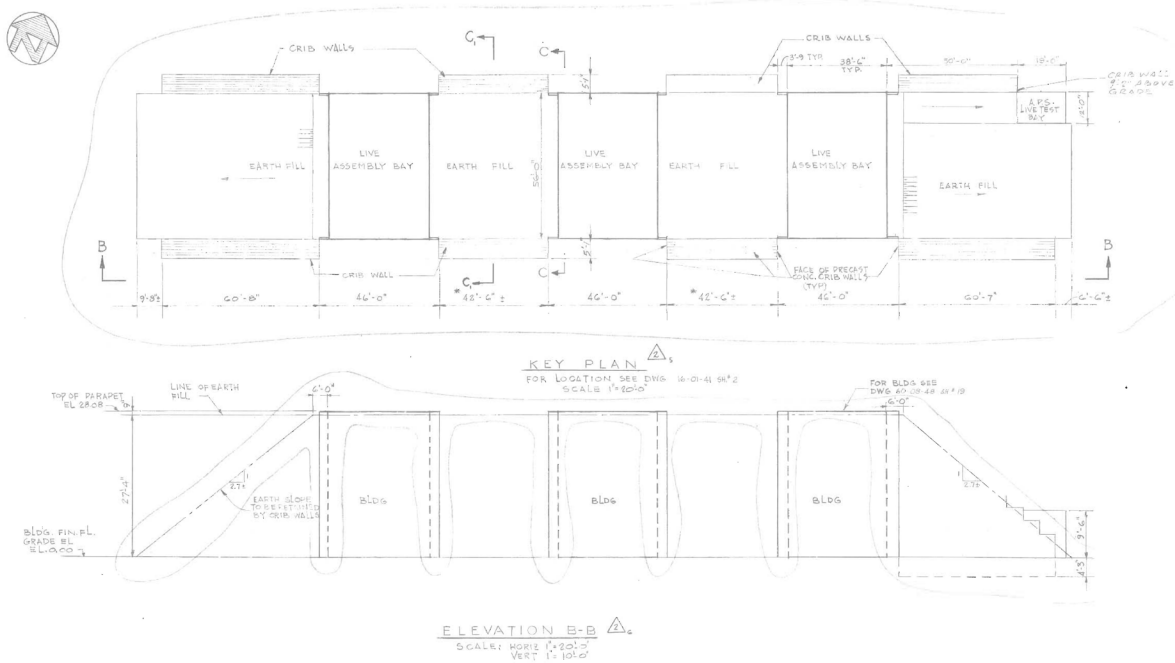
Property 23656, plan and elevation drawings from 1959 WS-IA plans.
